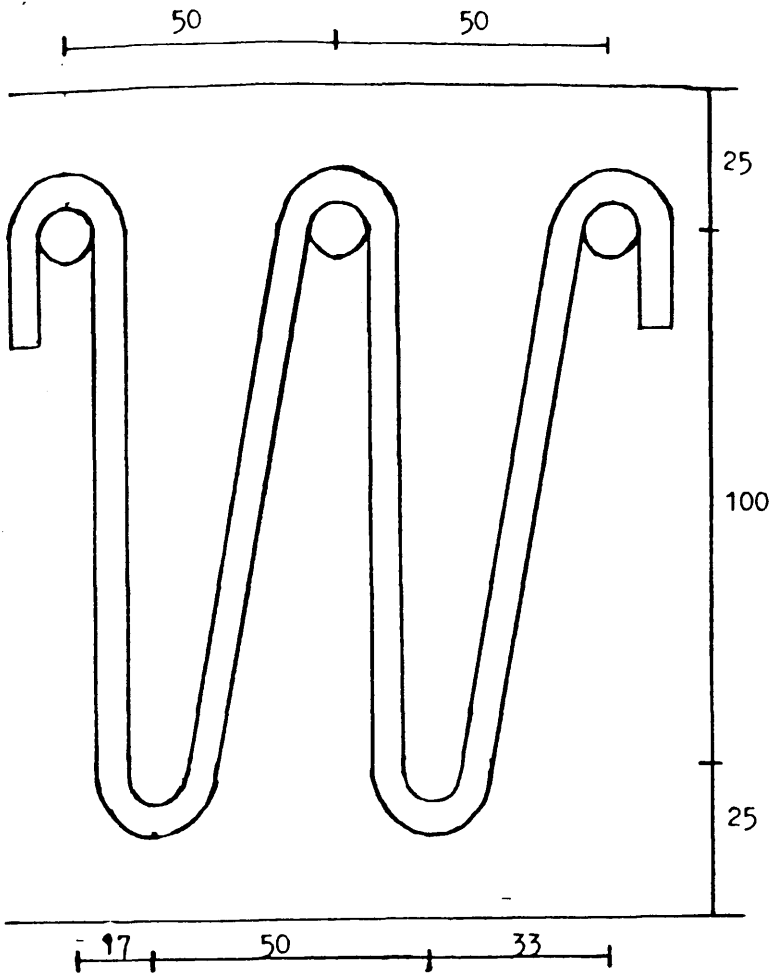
Type of shear steel used in the slab of models PS1 and PS2
